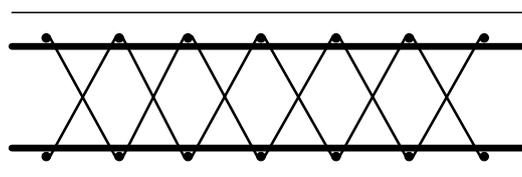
Typical Detailing for Reinforced Concrete Structural Element
